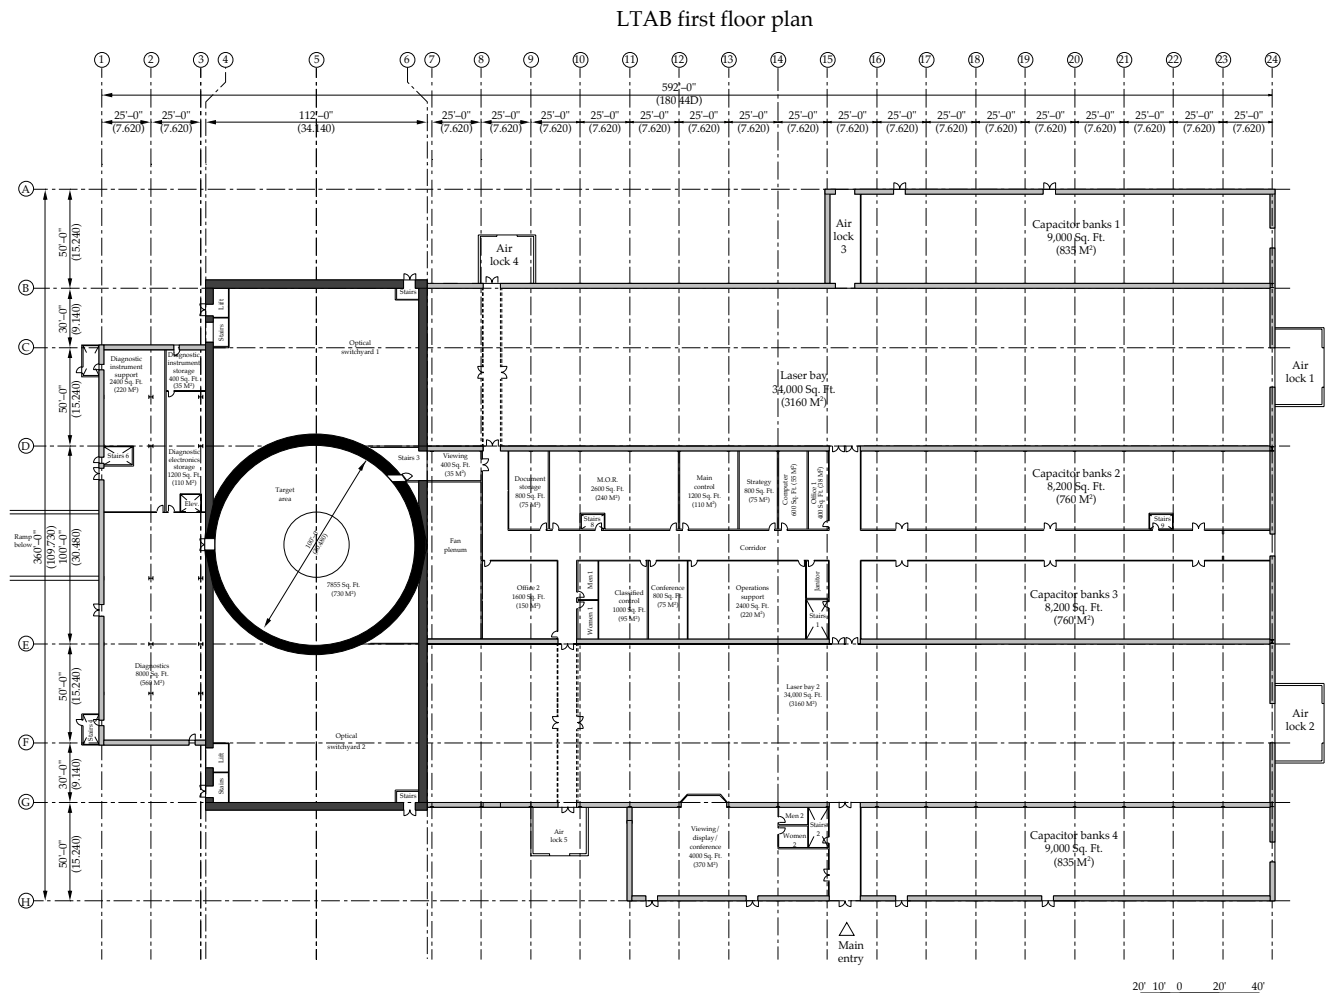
LTAB floor plan. (40-00-0394-1093)
